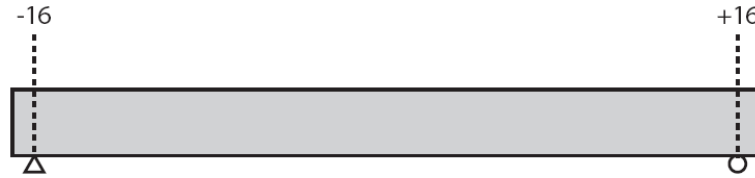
Flexural stiffness test configurations for the Wild Horse Creek Bridge girder
